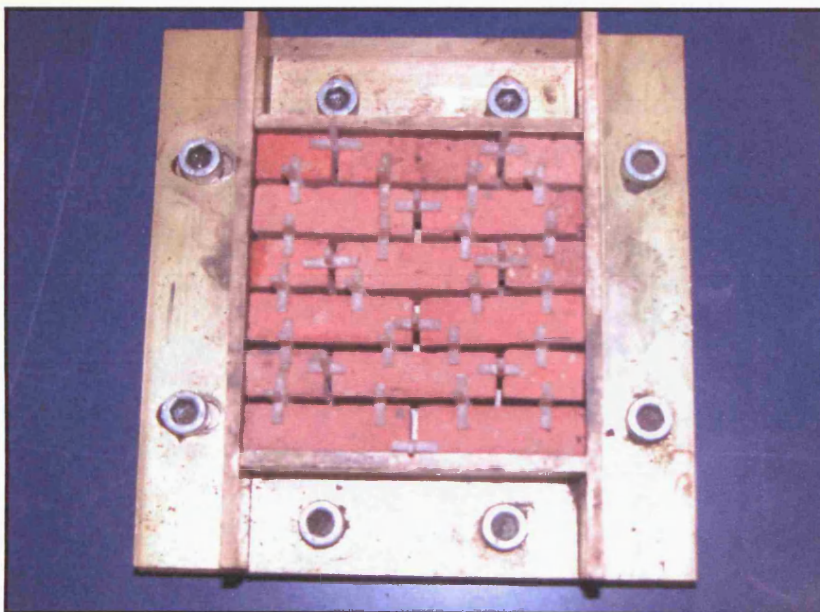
(b)- Sixth scale wallette specimen in preparation.
